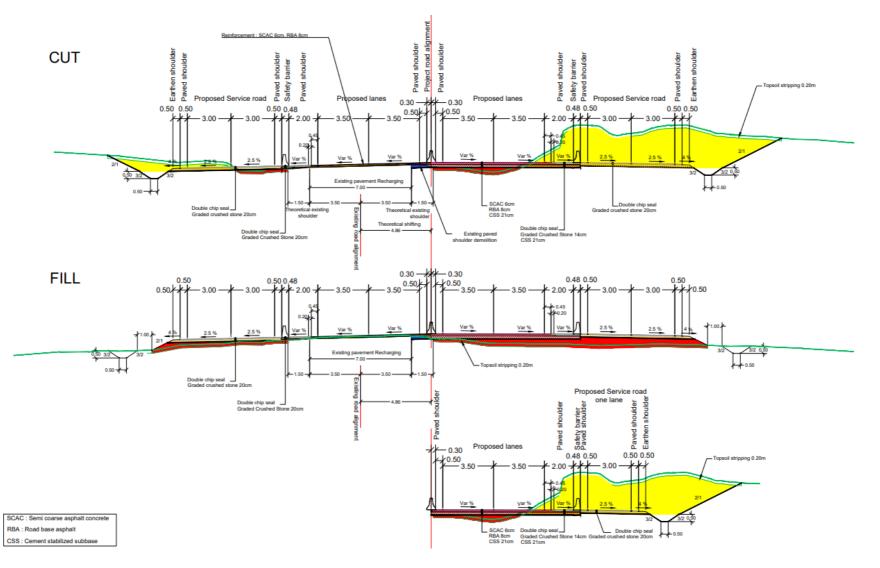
Typical Cross Section for Eccentric Widening of Existing 2-Lane Section to 4-Lane Divided Carriageway with Service Road in Rural Area and hilly terrain.
